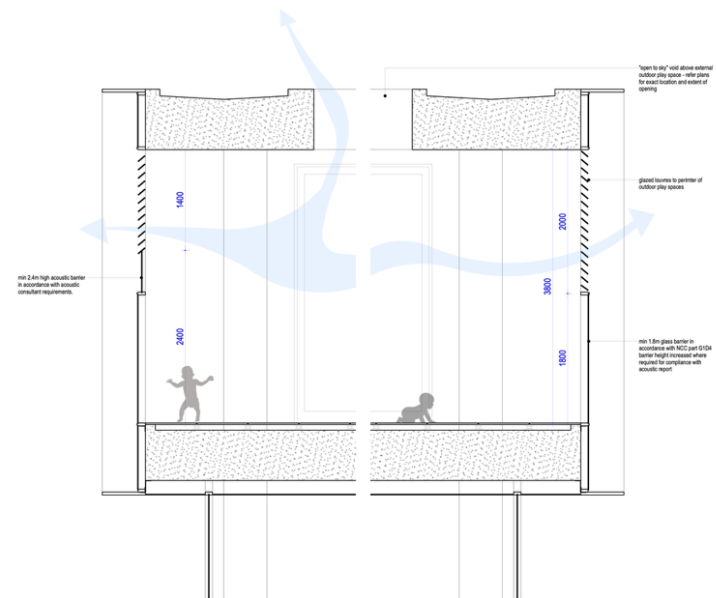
Typical Outdoor Play Space Façade Details indicating ventilation, acoustic and climability requirements.
